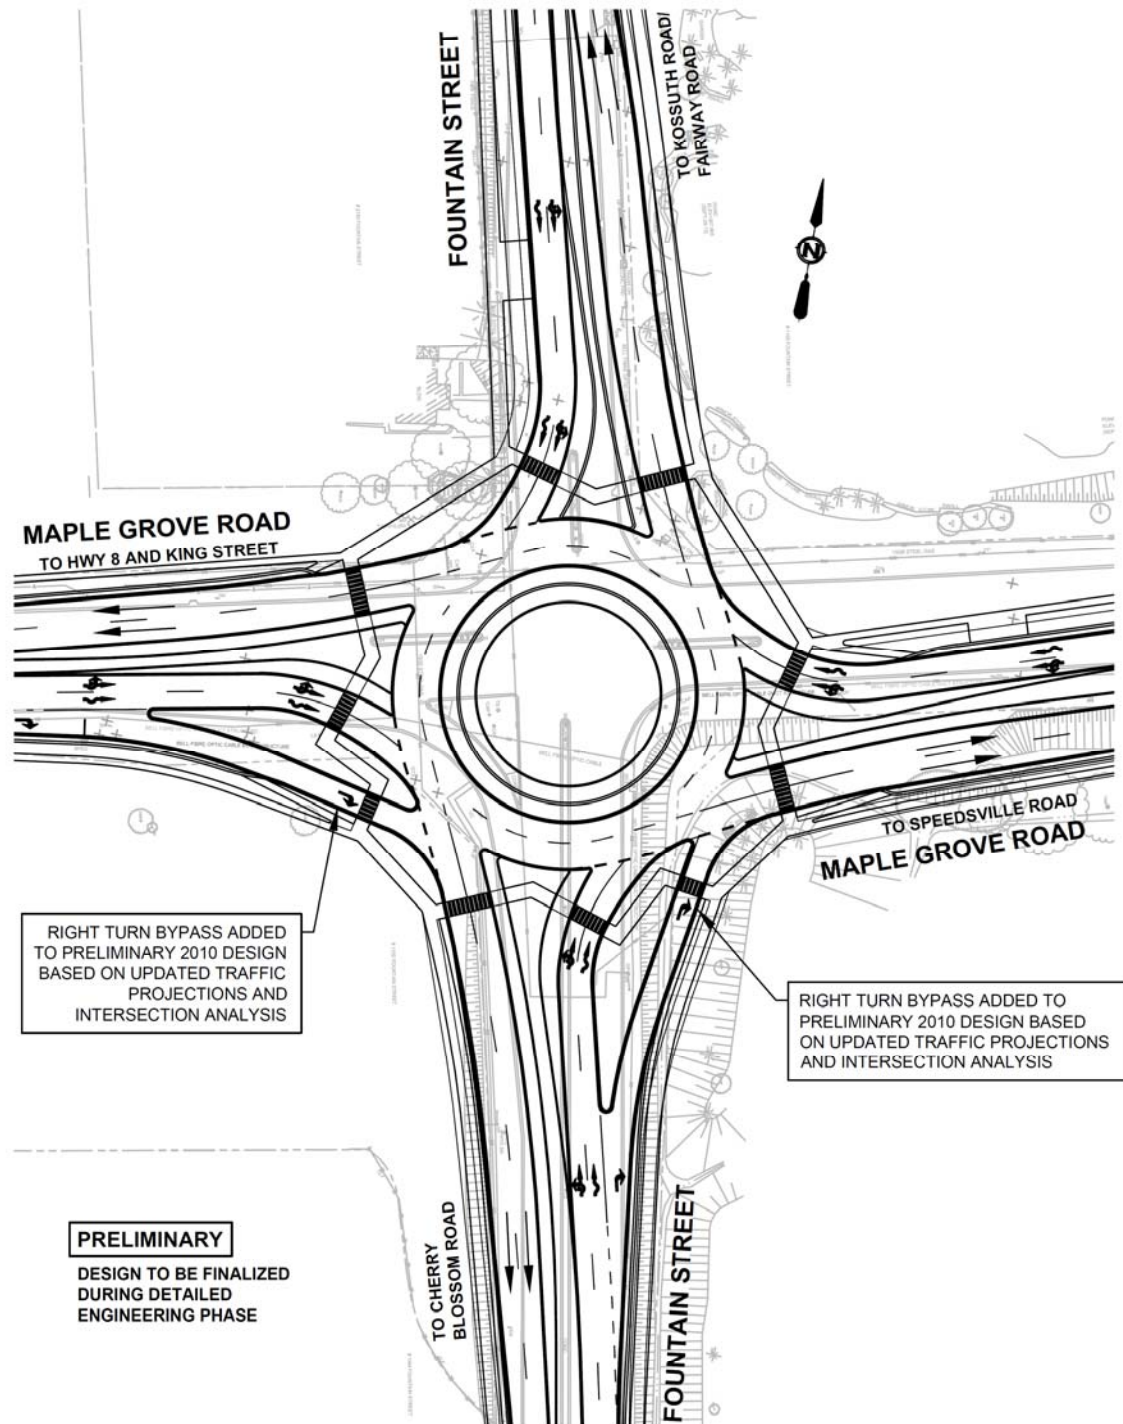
A Proposed Roundabout at Fountain Street and Maple Grove Road (Interim 2-Lane Configuration)
